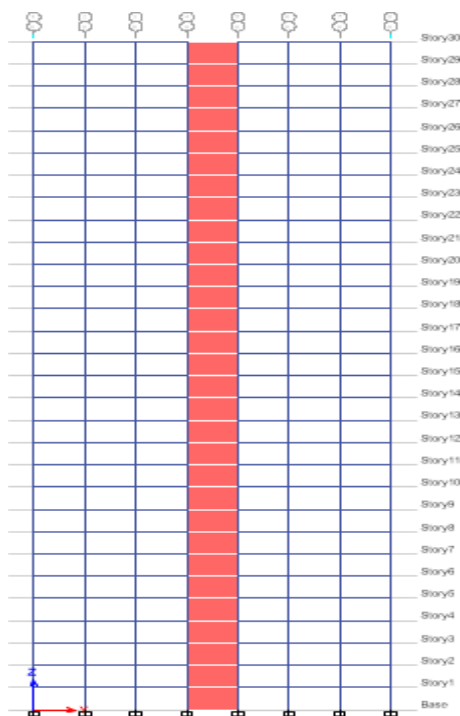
R.C. BUILDING WITH SHAER WALL
